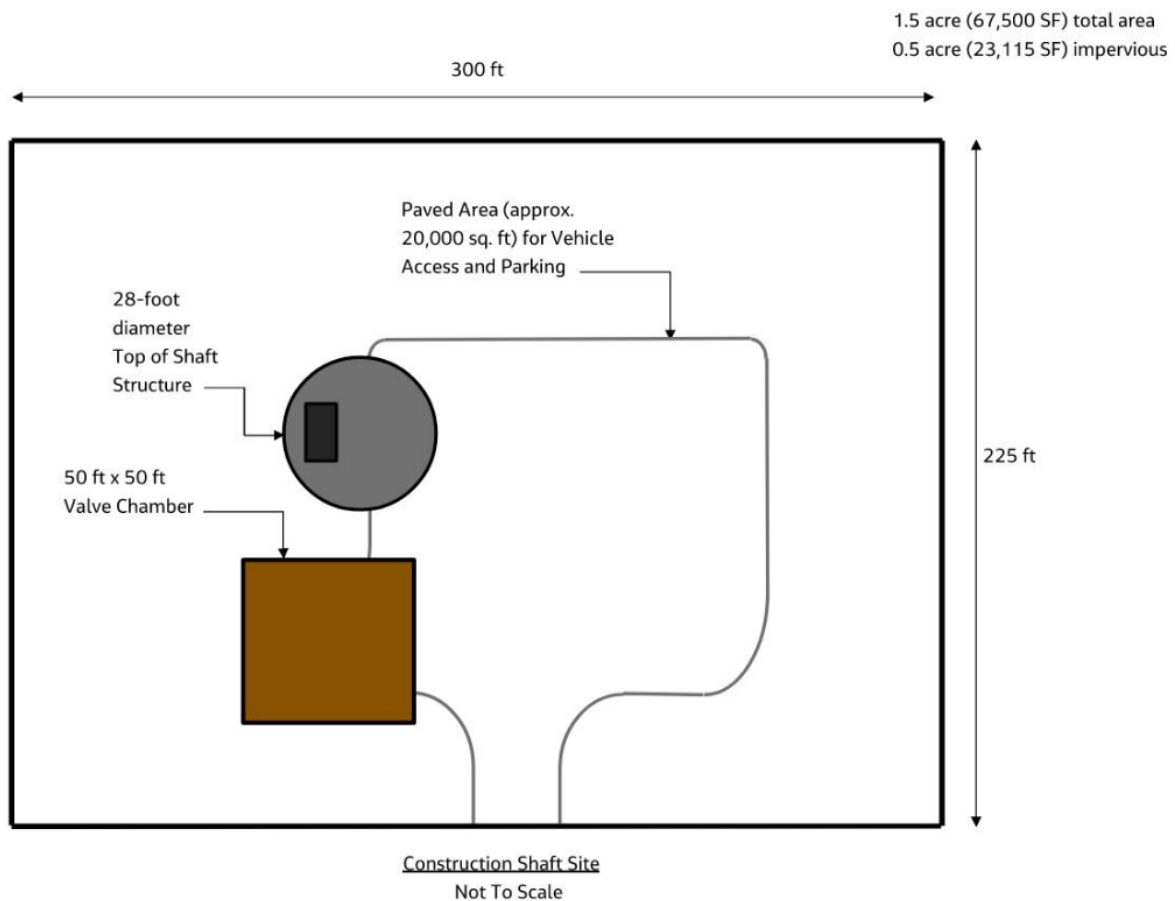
Example Prototype Intermediate Shaft As-Built Site Layout
